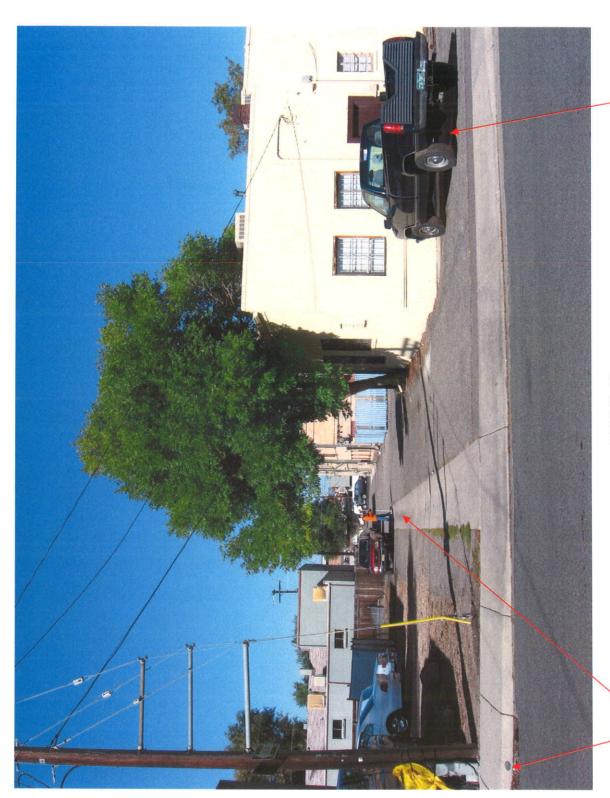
View of the front of the building at 7100 West 38<sup>th</sup> Avenue that was leased to Calvary Temple Christian Church.
